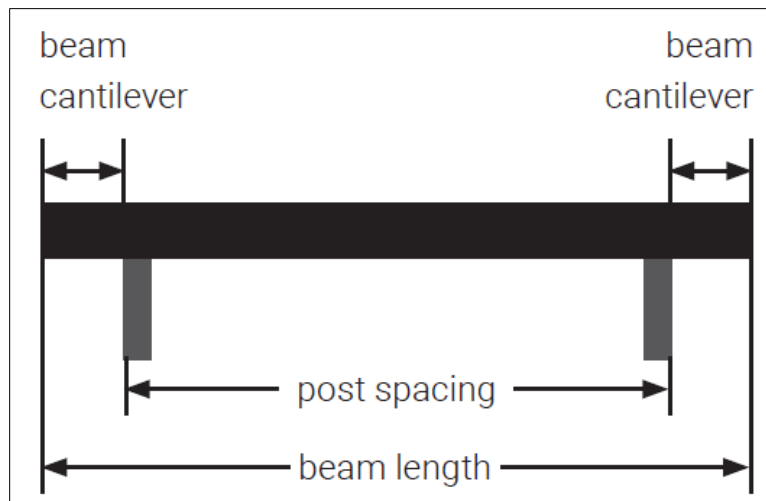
Post Spacing for Support of Beams at Two (2) Locations
